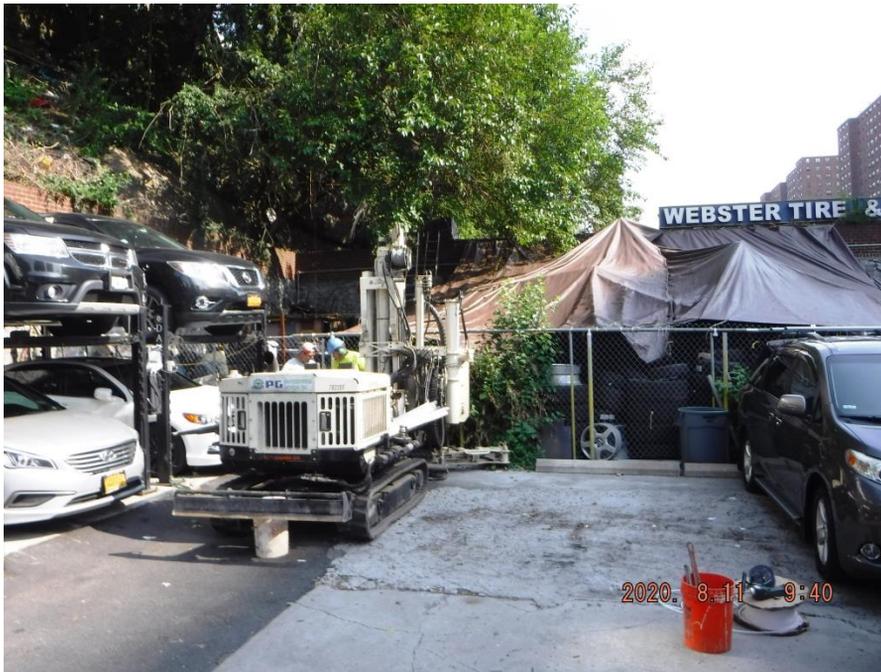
View of the Site looking north. Tire sales/installation operation at background.
